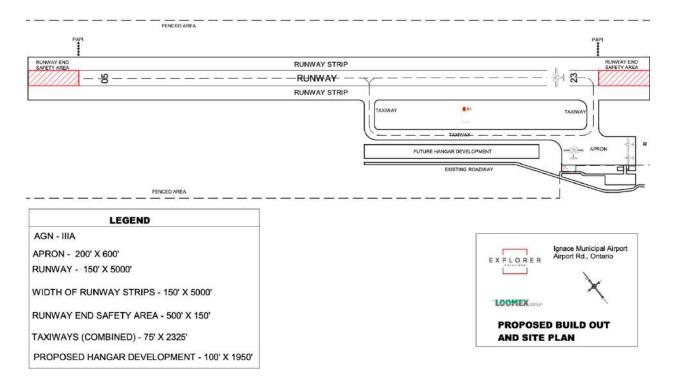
Proposed buildout and site plan, Ignace Municipal Airport.
